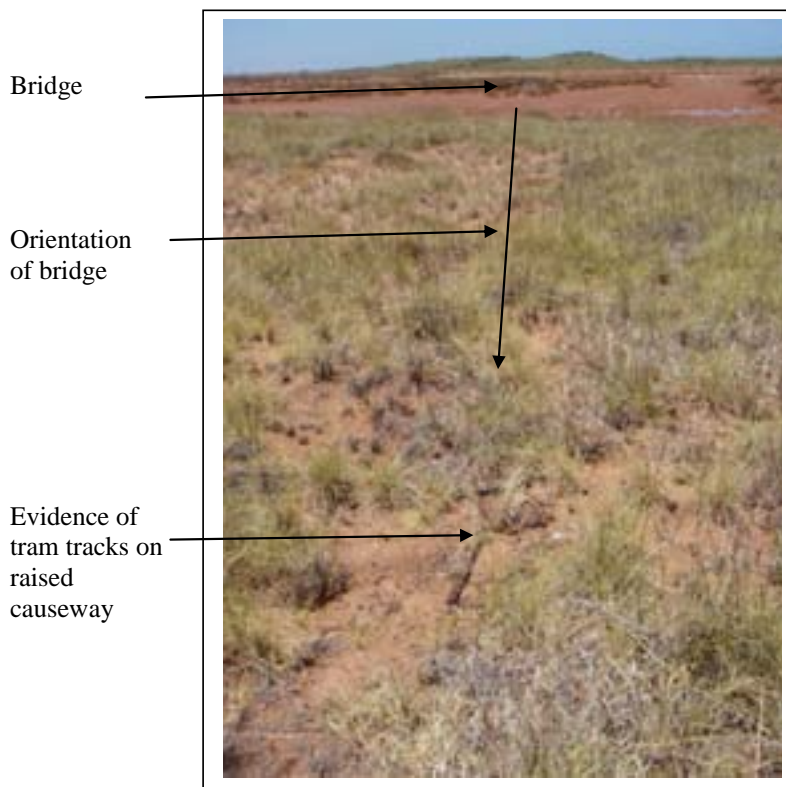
View of bridge from section of raised tramway causeway south of 4WD track
